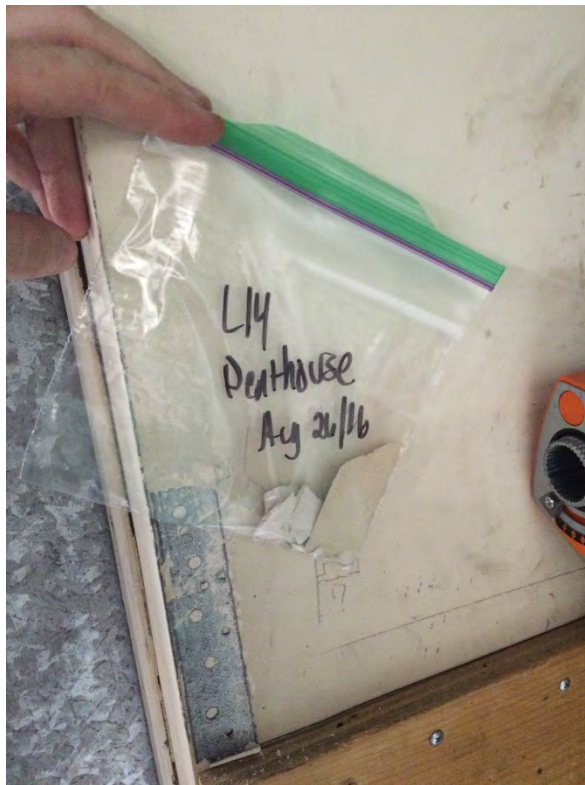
Asbestos sample A40, drywall joint compound collected from wall of penthouse in Pod L14. No asbestos detected.
